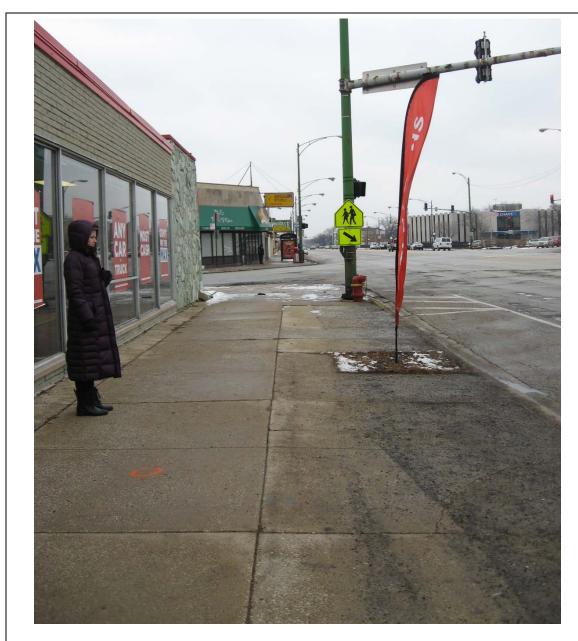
View of sidewalk adjacent to Chase Bank, the proposed location for the north Austin/Ardmore Station, looking northwest.
